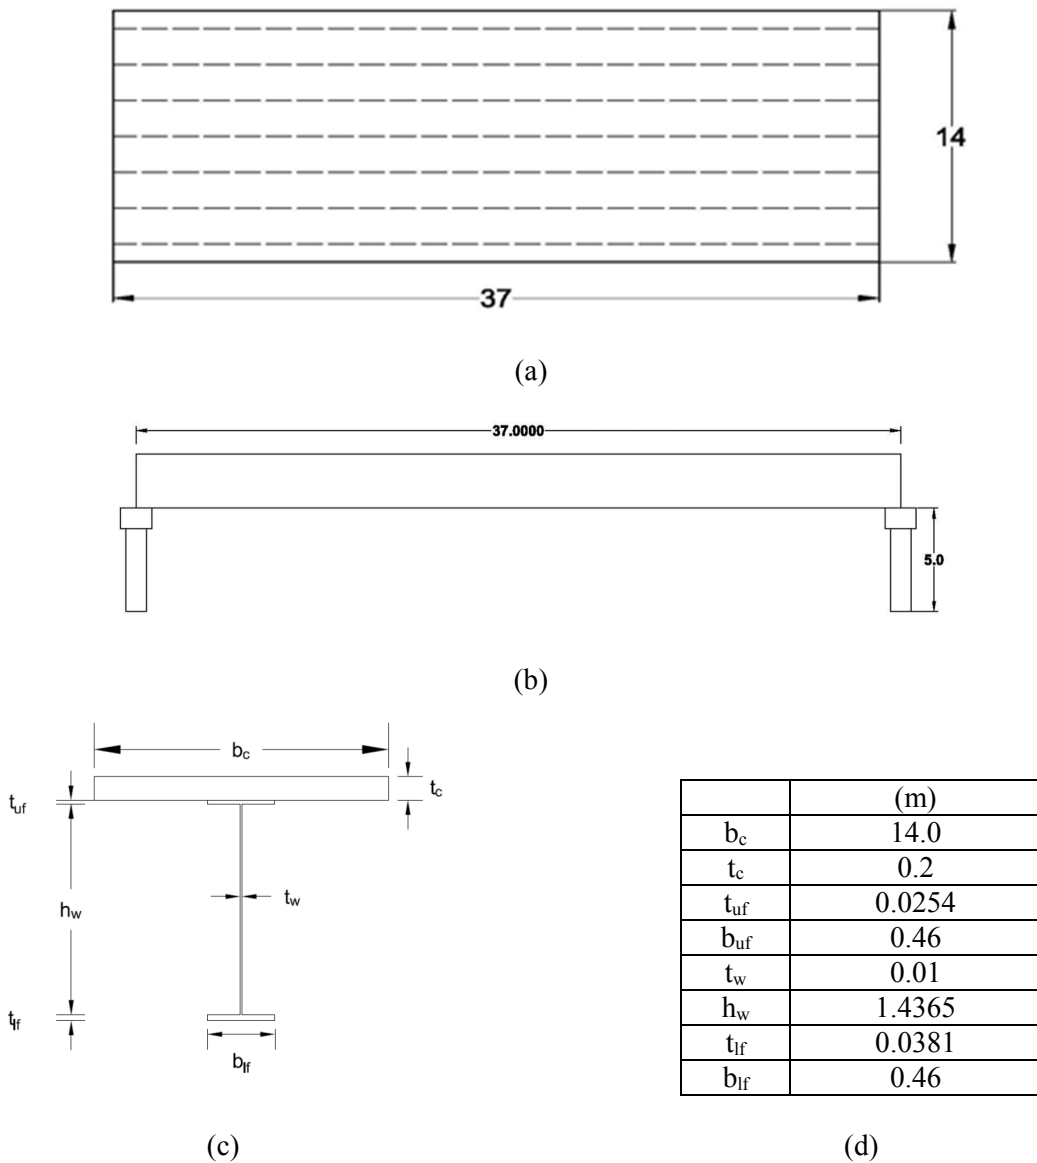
A typical multi-lane highway overpass bridge according to FHWA : a) top view, (b)elevation view, (c)cross-sectional view, (d) geometric definition of a typical girder. All dimensions in (m).
